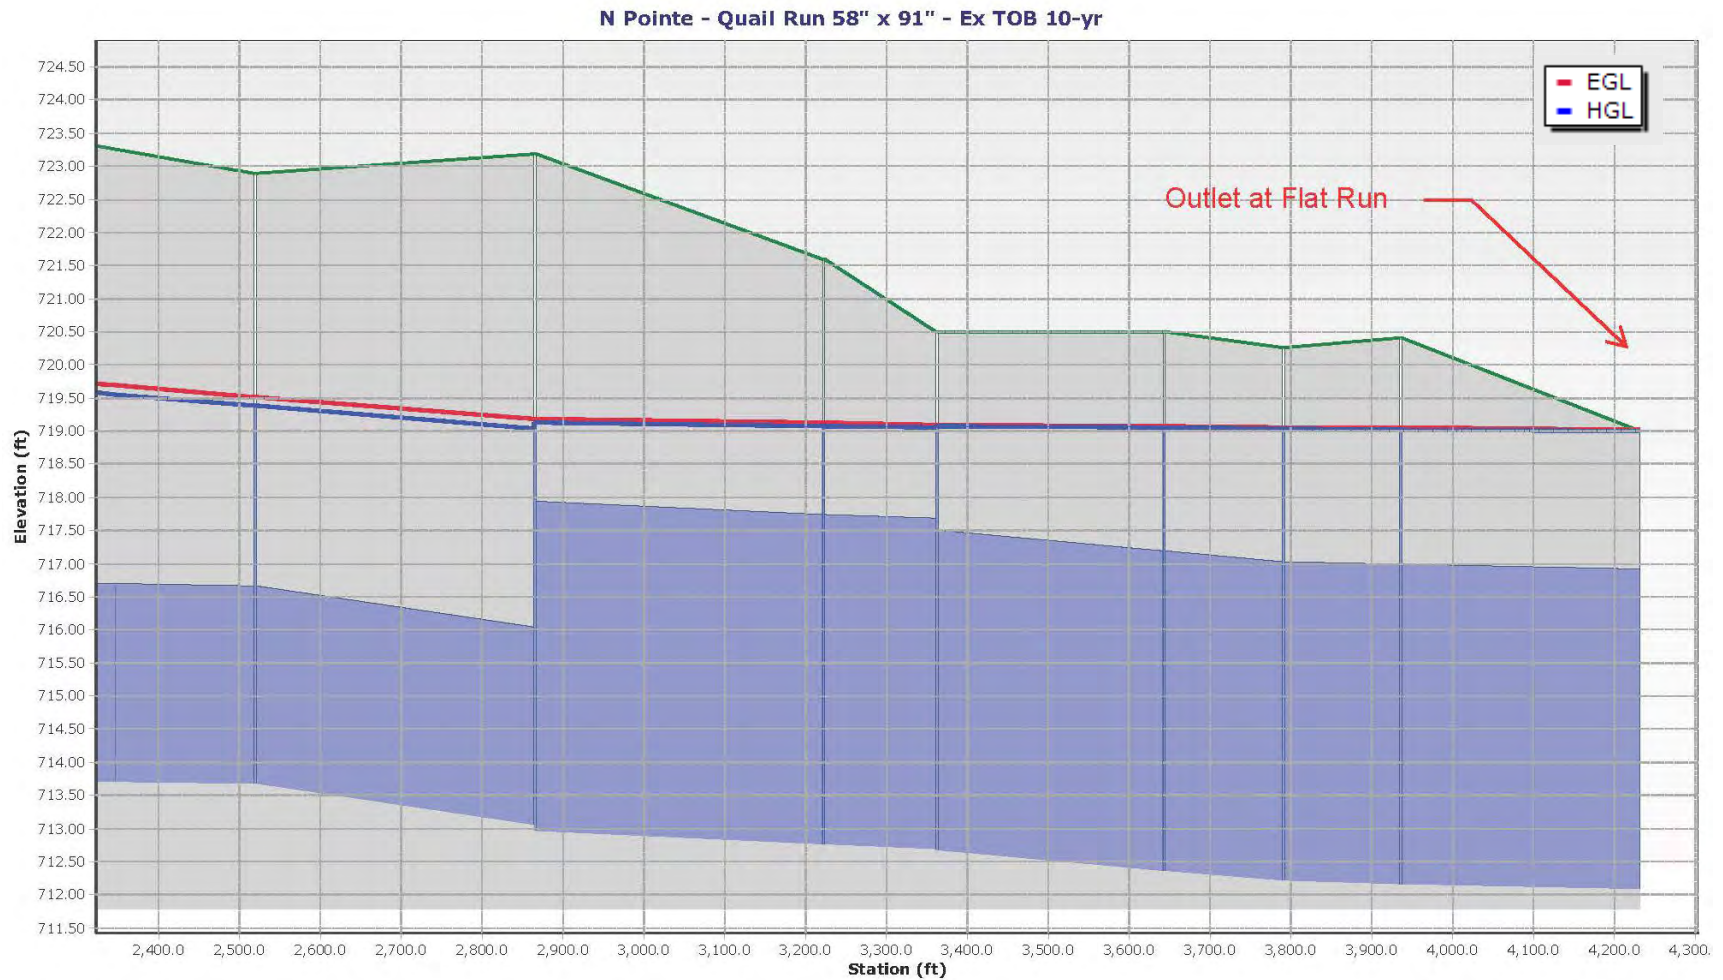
Quail Run Storm Sewer Hydraulic Profile
